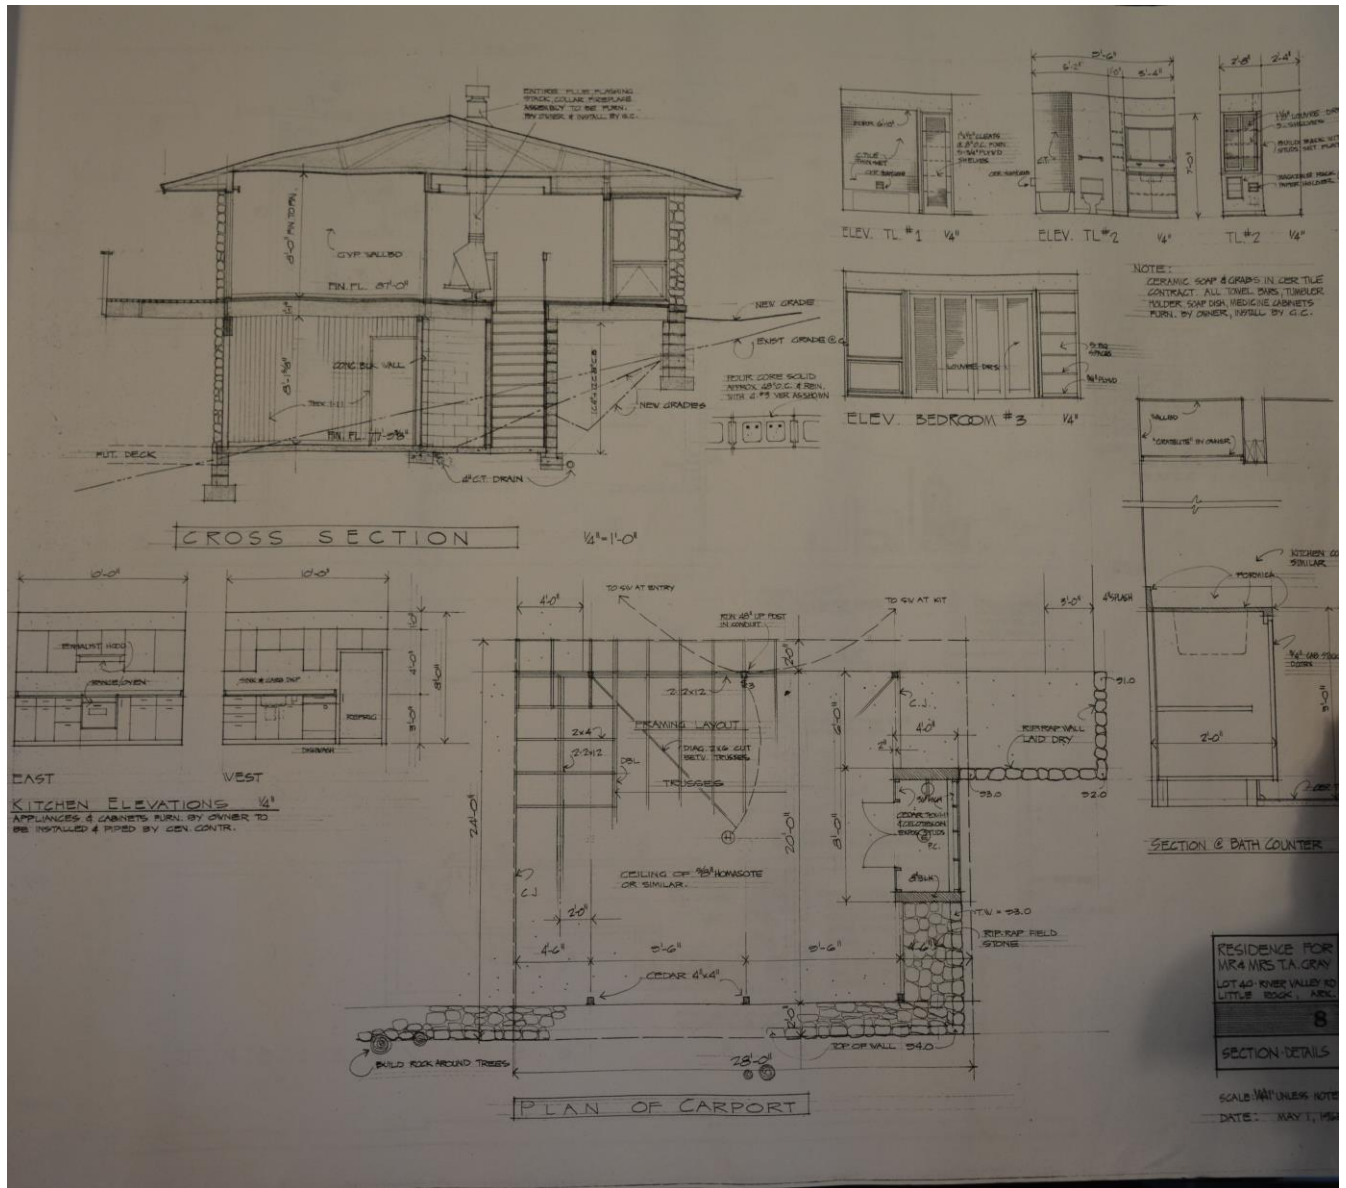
Section, Details, and Carport plans of the Thomas Gray House, 1963.
